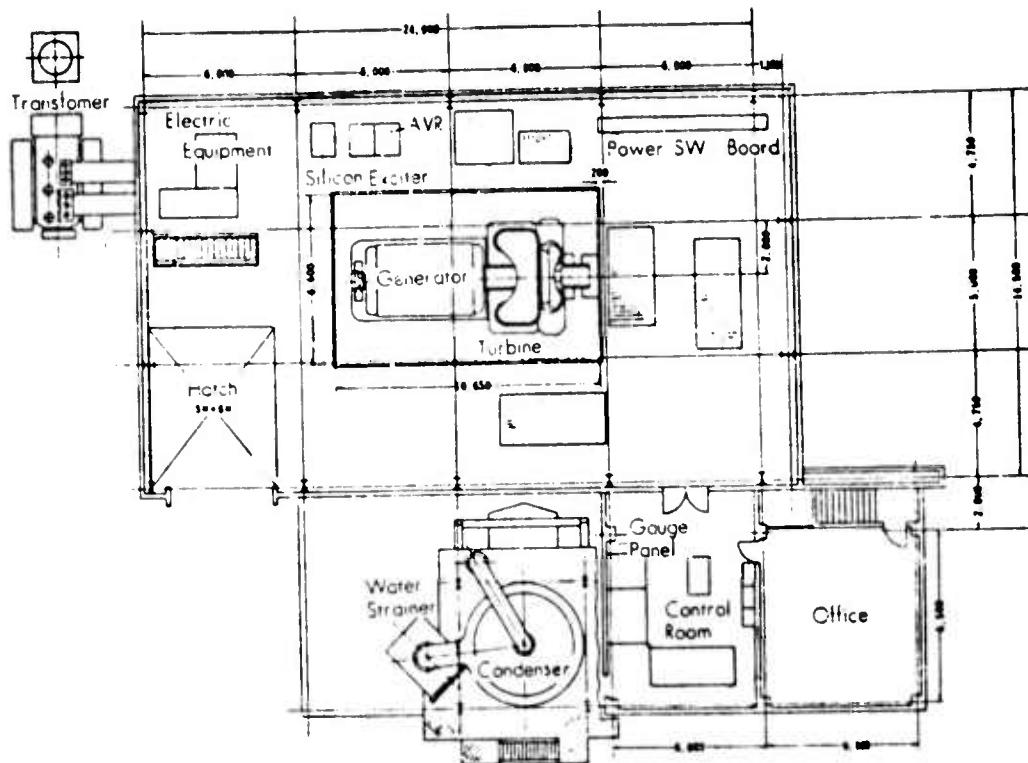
Plan of Otake power plant (dimensions in m) [205] .
